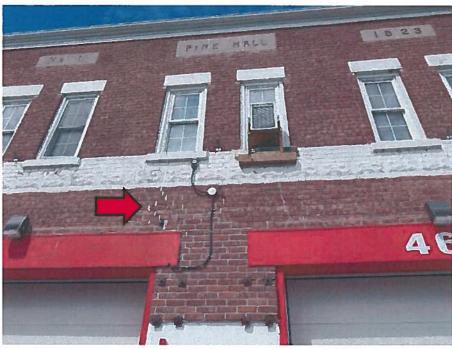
East face of 1923 building. Note evidence of previous crack repair.
